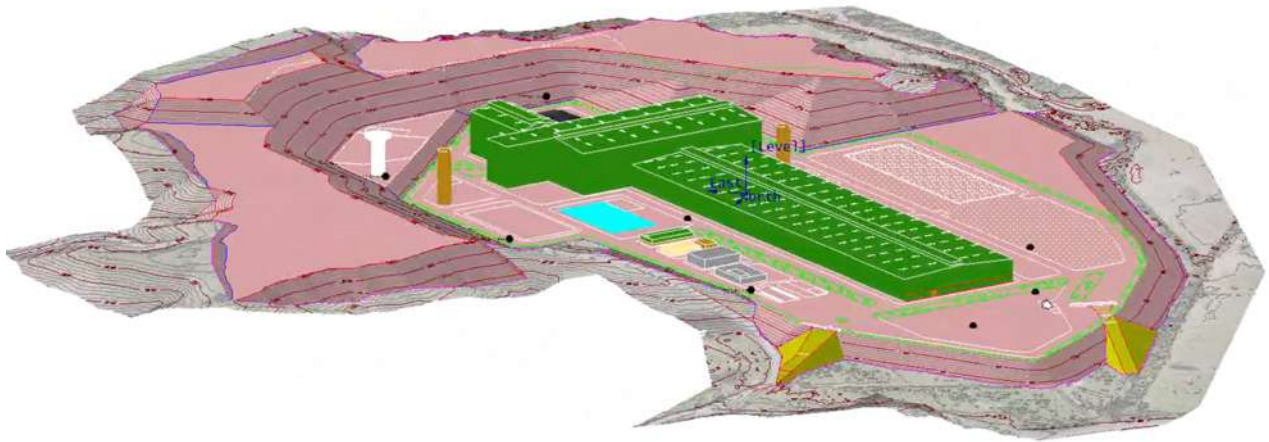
Proposed steel manufacturing plant layout with proposed land modification against existing landform (diagrammatic view only) ¹²
